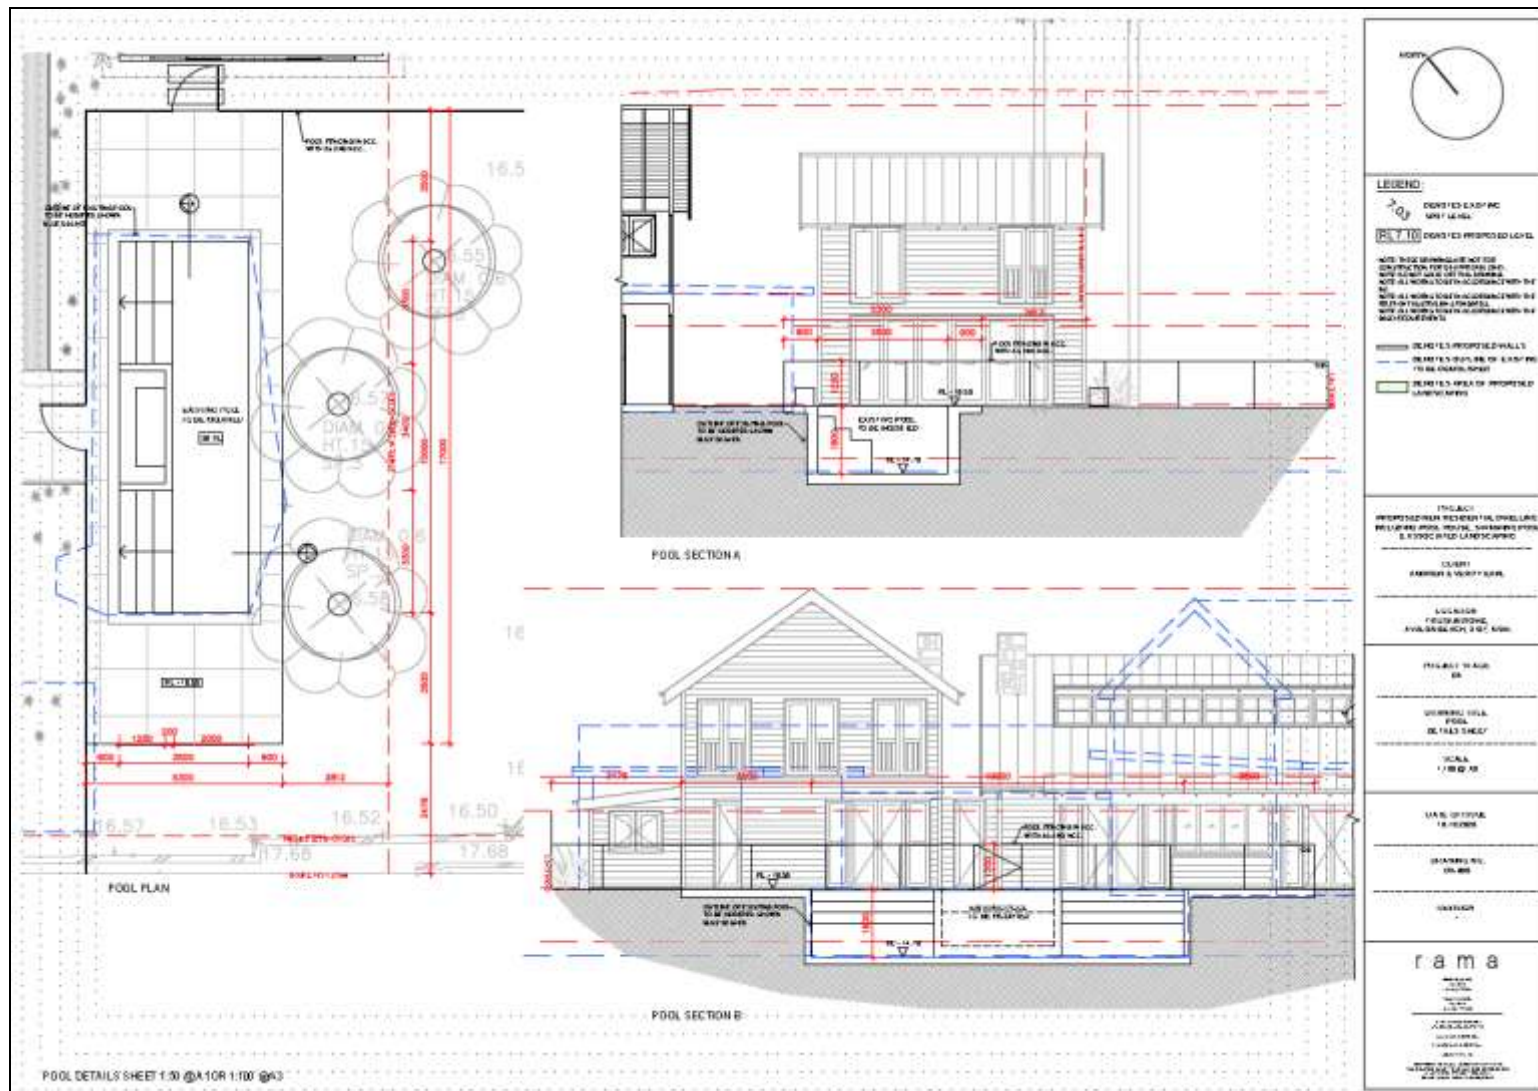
(Above & previous pages) Illustrates the proposed Site Plan (with discussed tree locations plotted), Roof Plan, Elevations, Landscape Concept &Swimming Pool Plan/Elevations.
